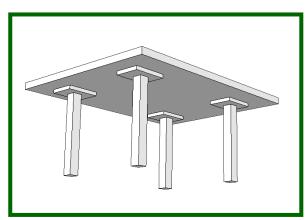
A sketchup model of the layout of a two-way flat slab system.
